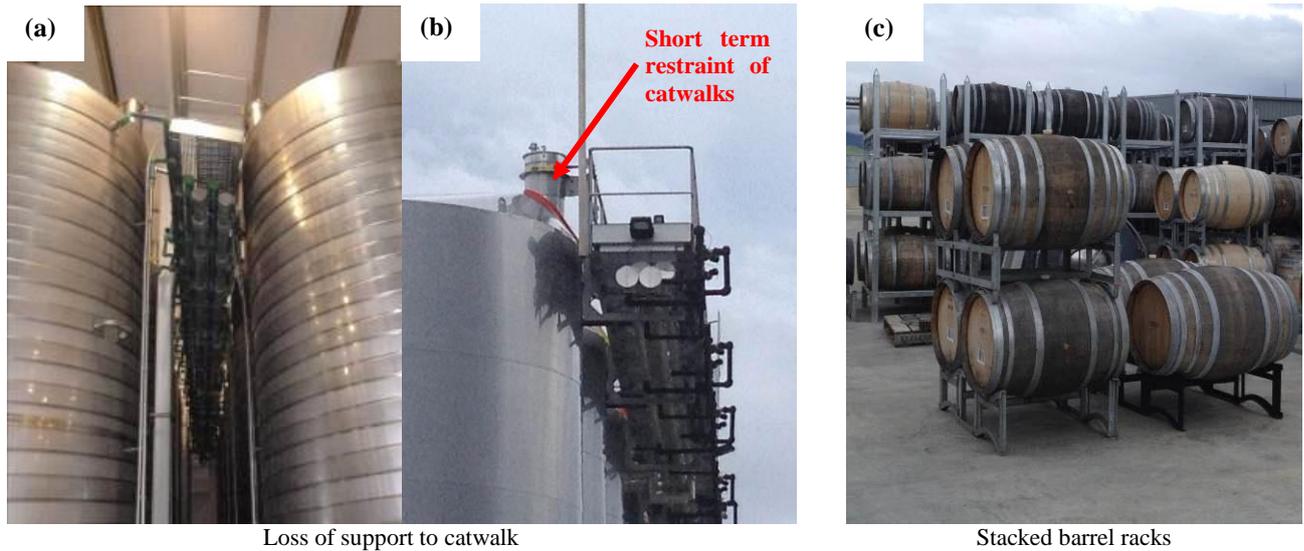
(a) Catwalks were damaged at connections to tanks; (b) temporary catwalk restraint to tank turret; (c) stacked barrel racks.
